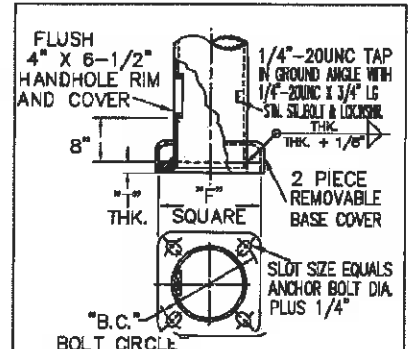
DETAIL F ORIENTATION FOR SINGLE ARM POLE
